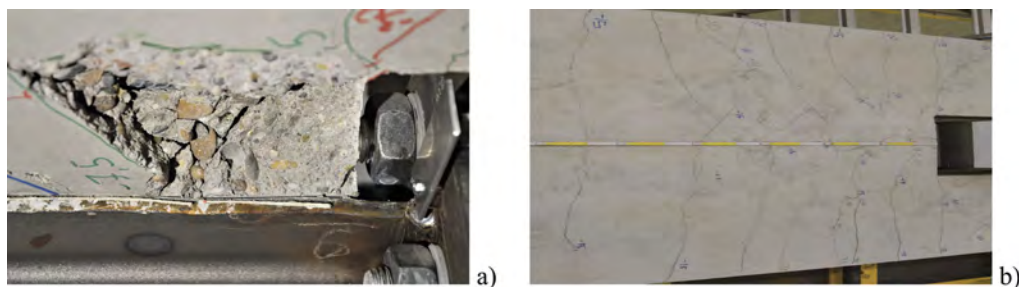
(a) Concrete crushing in the area of connection at a rotation of 45 mrad (b) crack pattern of the concrete slab at a rotation of 45 mrad.
